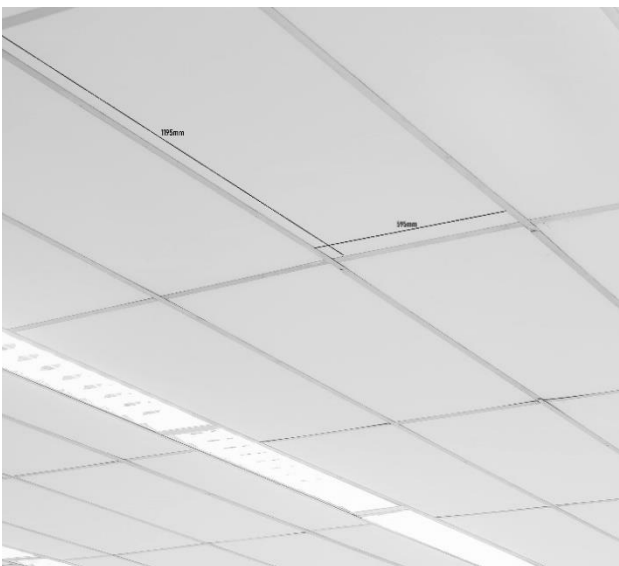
SUSPENDED GYPSUM WHITE VINYL CEILING AND TILE SIZE
